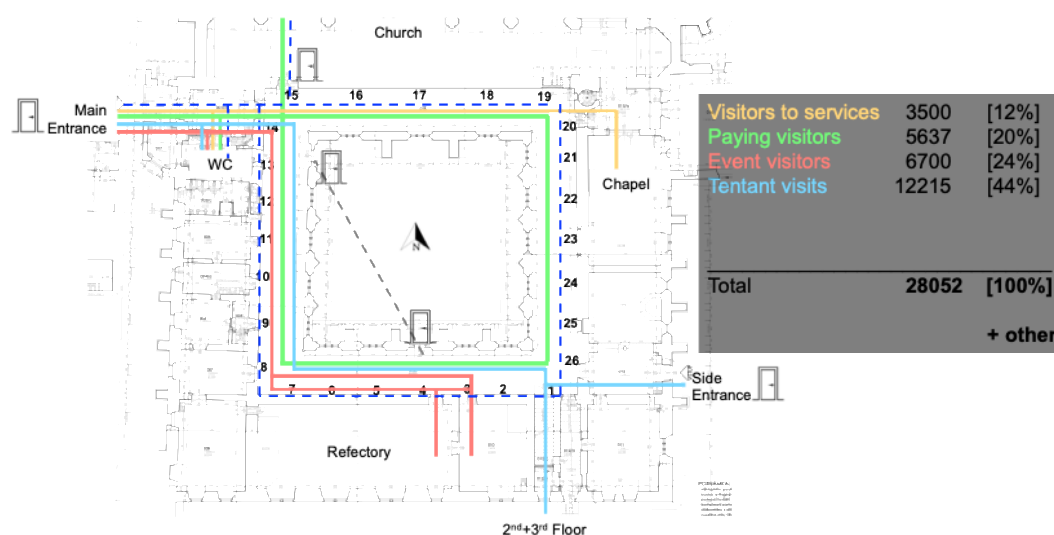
"Typical routes" in the Emmaus Abbey, ground floor. Floorplan C3.1 ©Archiprak –Projectová Kancelář M.G. Parma 2010 (modified by Rebecca Tehrani).
